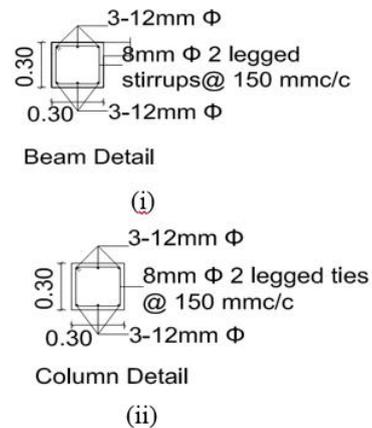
(b) Reinforcement details for (i) Beam & (ii) Column
